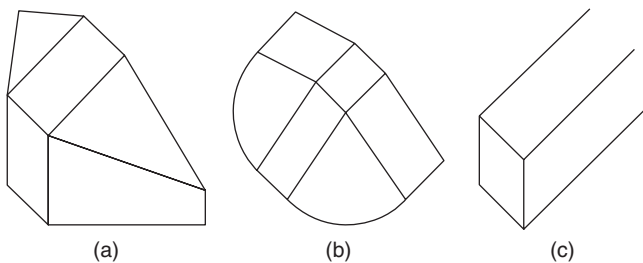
Abutment shapes: (a) Wing-wall abutment. (b) Spill-through abutment. (c) Vertical wall abutment.
